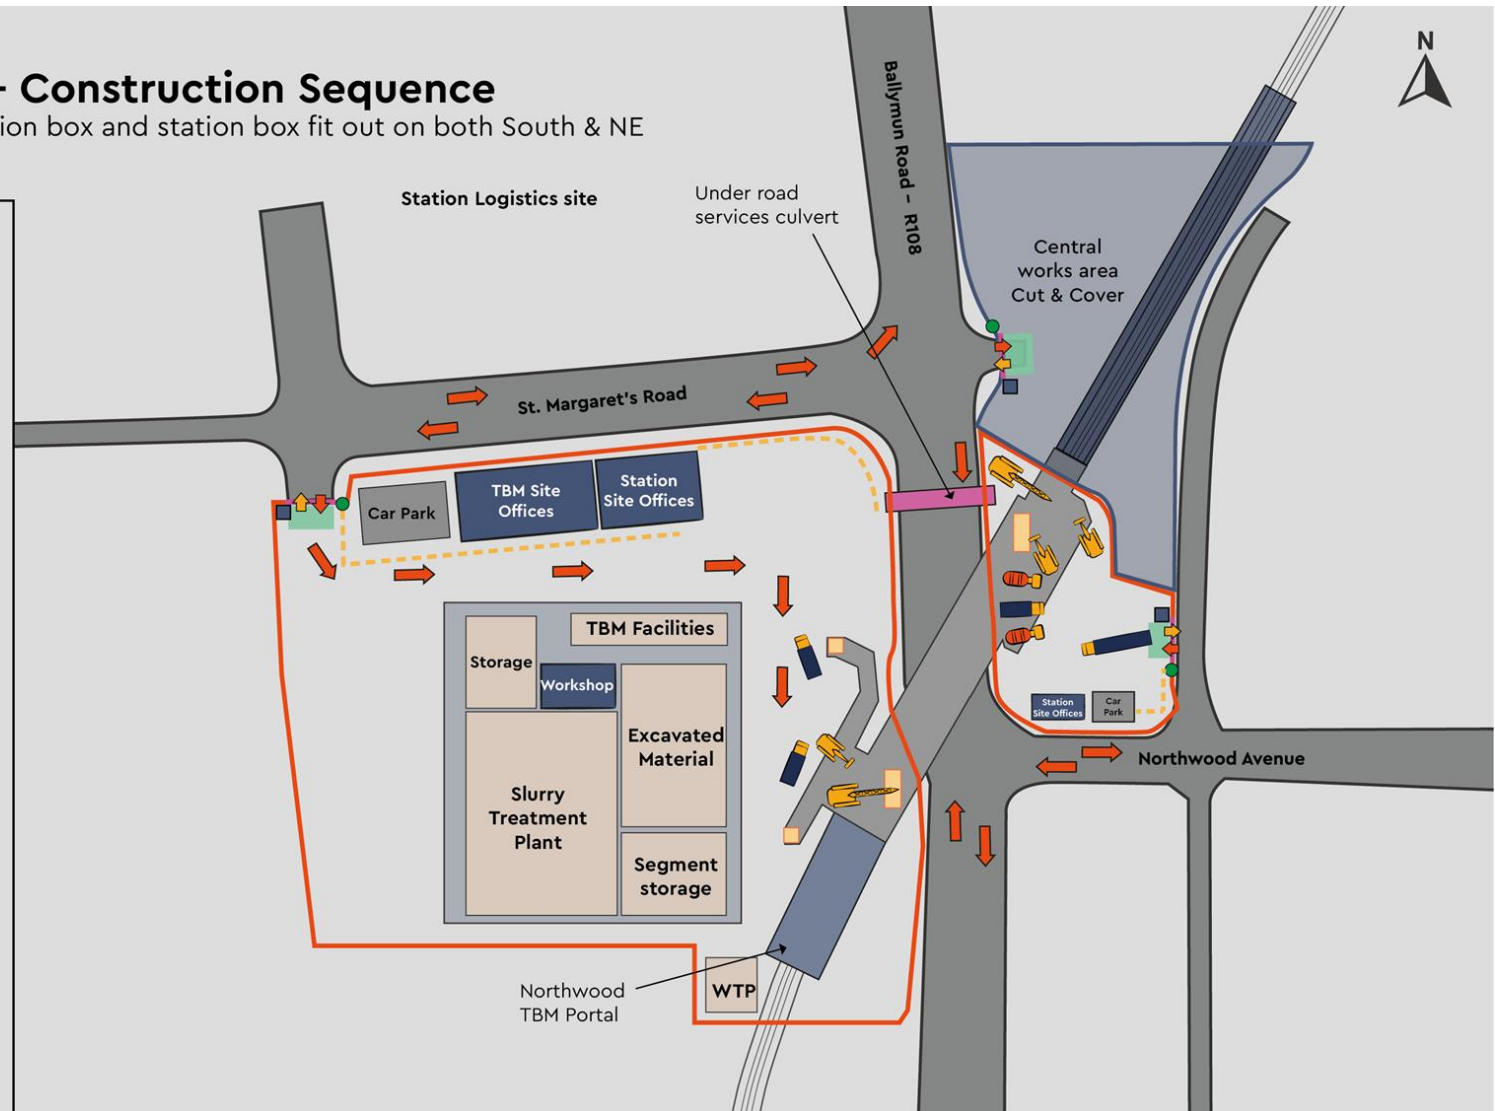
Northwood Station and Portal Stage 8 - Handover of TTM
